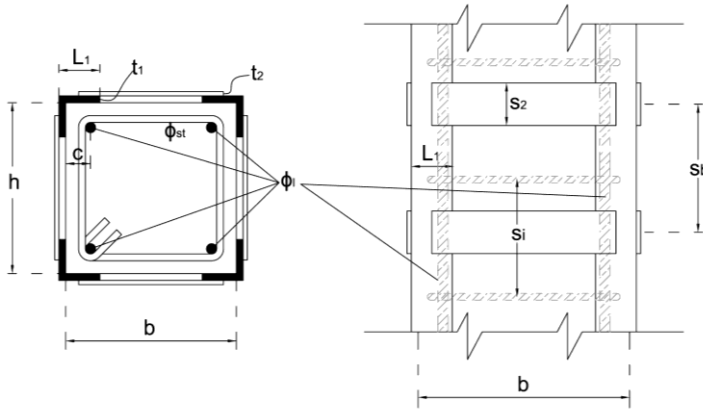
Arrangement of internal and external reinforcement on the column.
